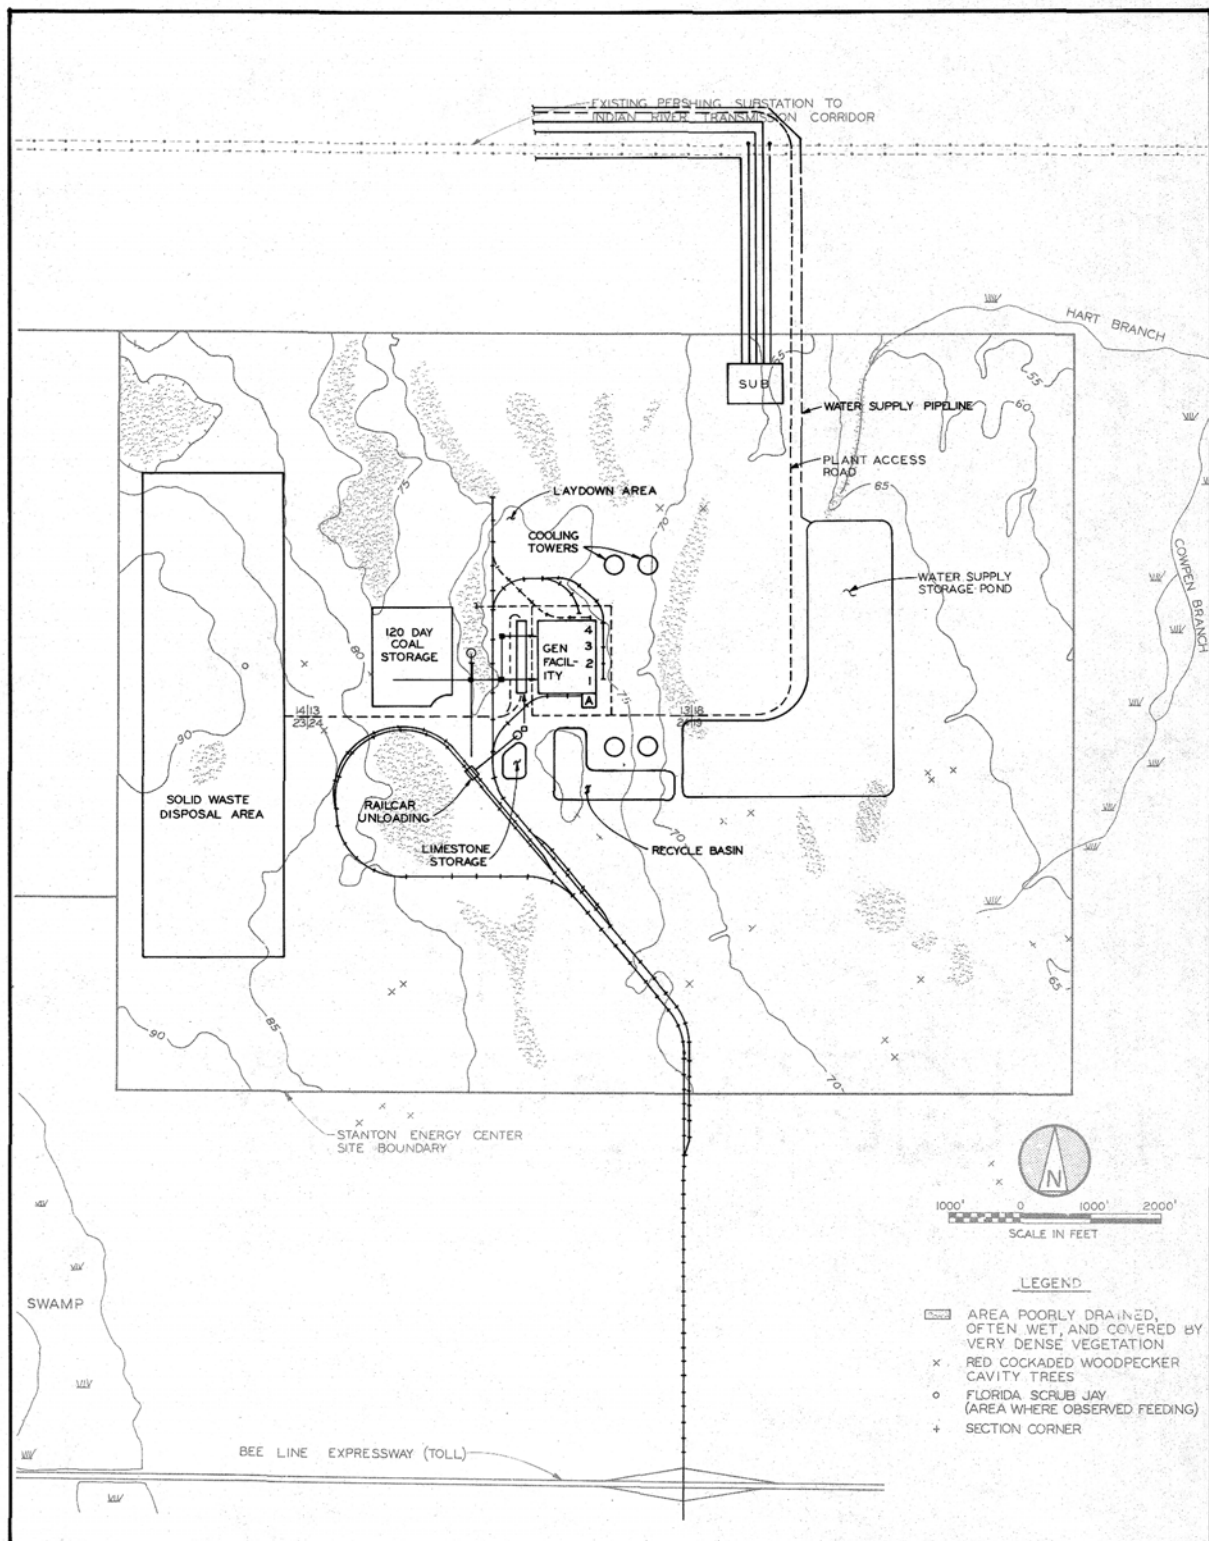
SITE ARRANGEMENT-PLAN B
